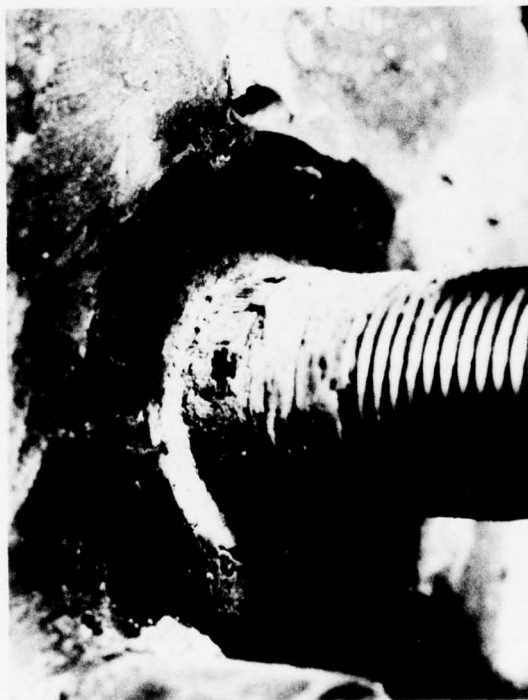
Detail of the seaward end anchorage plate in beam 11 not very rusted except at hole
